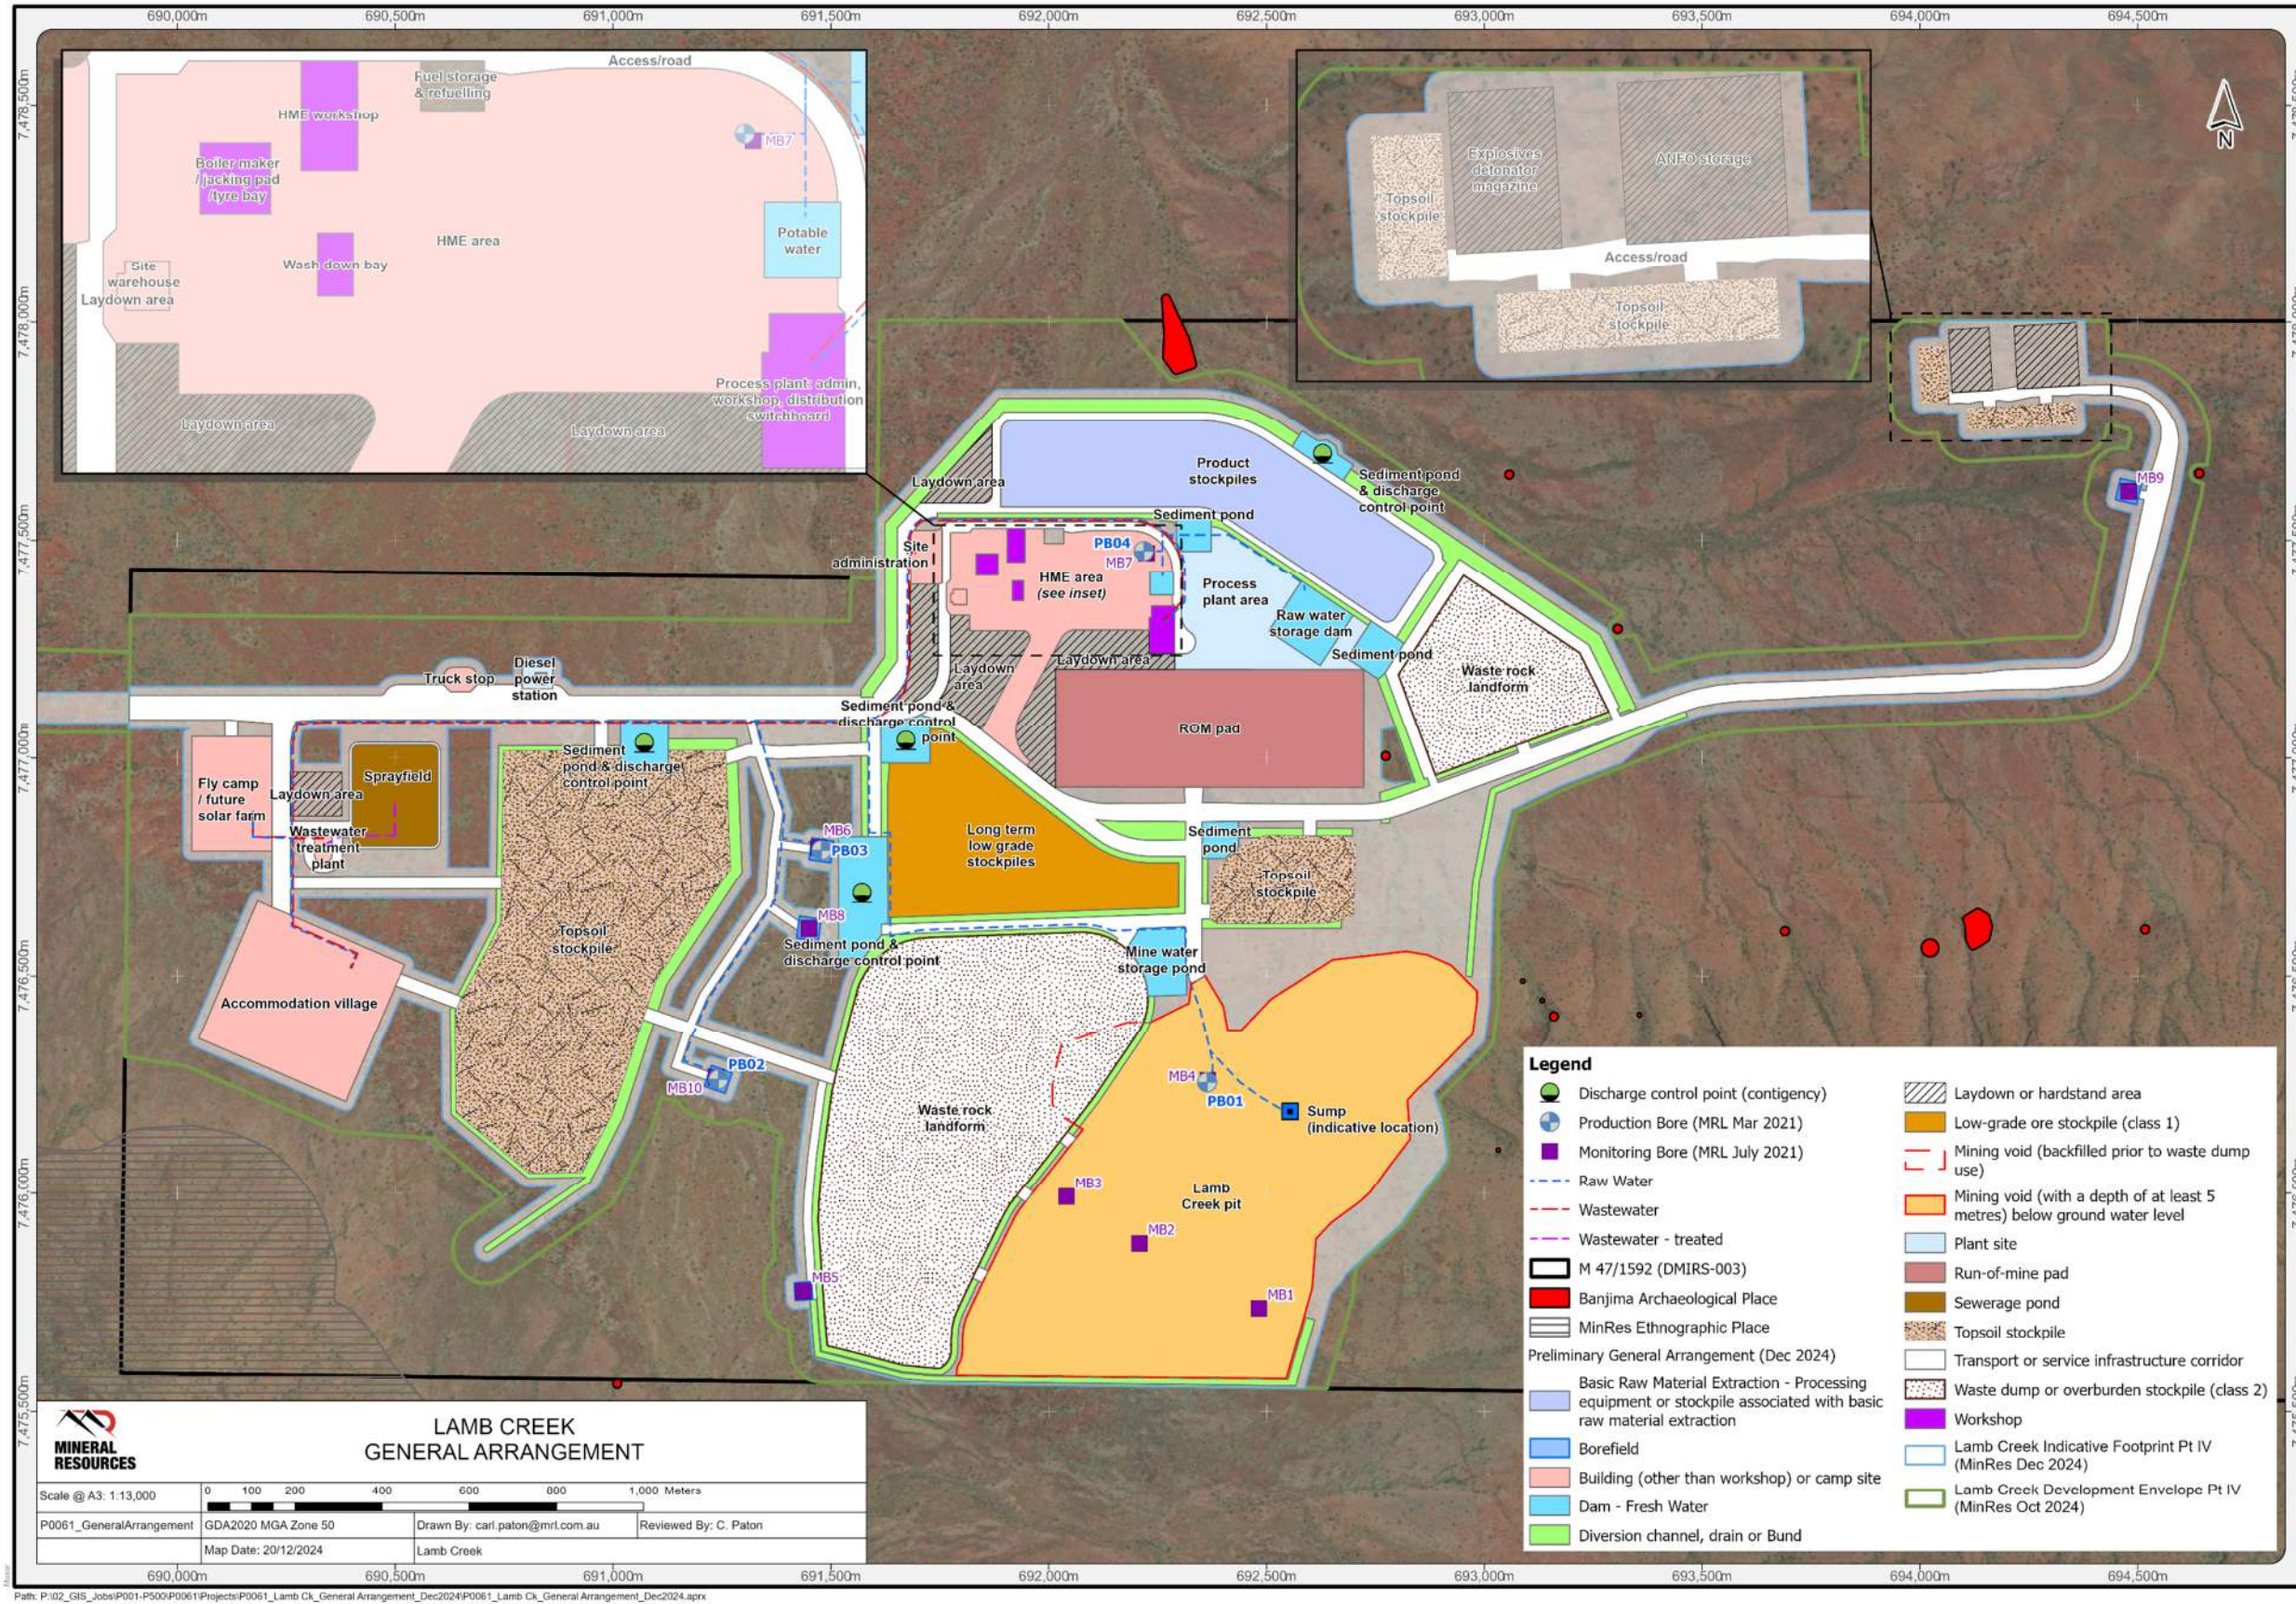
PROJECT SITE - GENERAL ARRANGEMENT
